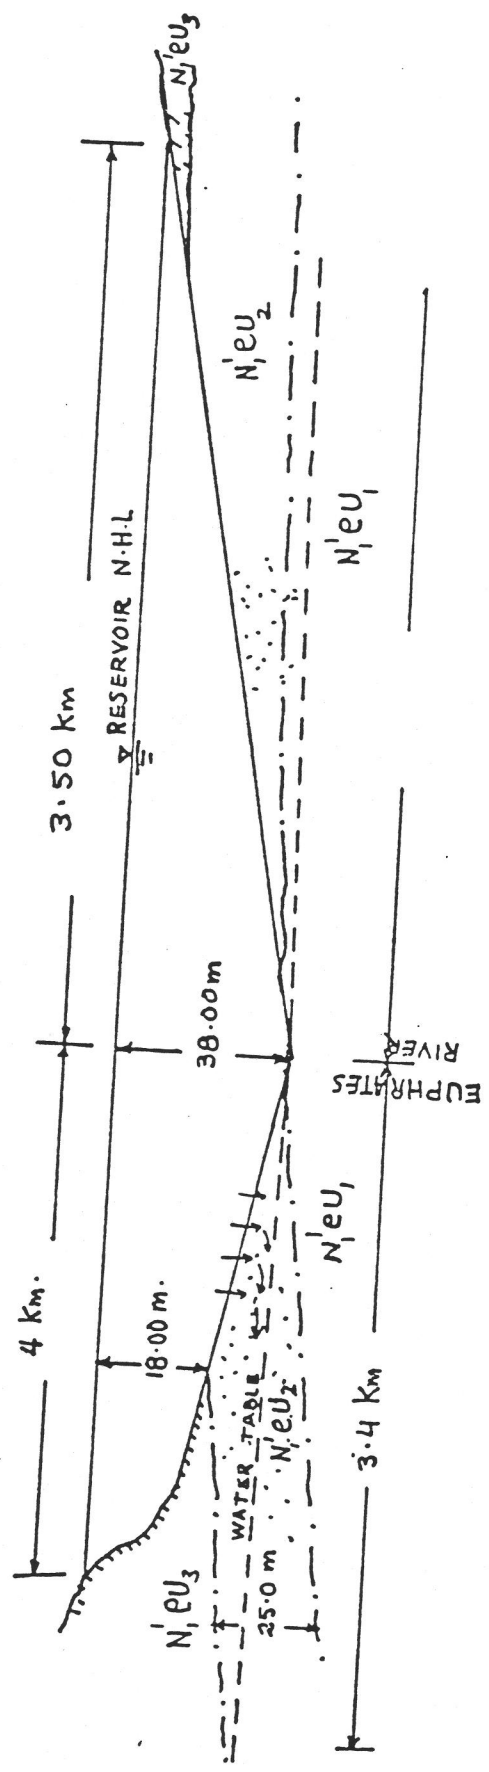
Cross Section at Dam Site Showing Head and Seepage Layer
